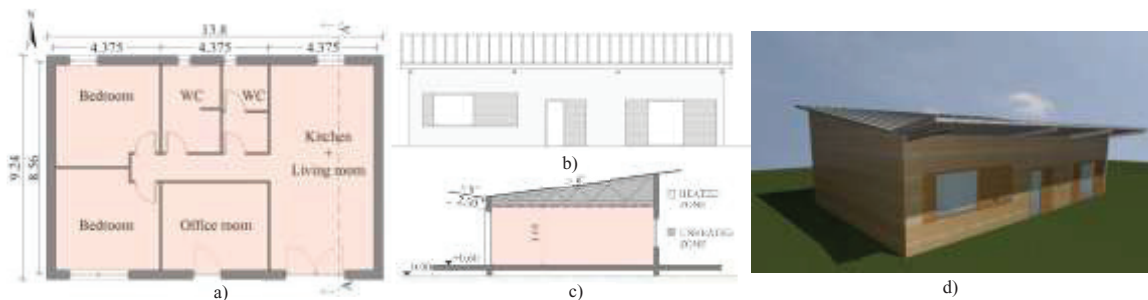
Reference building: (a) Plan, (b) South façade, (c) A-A' Section, (d) 3D View
